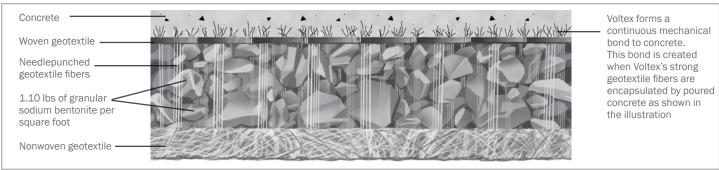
Cross section illustration of Voltex waterproofing membrane mechanically bonded to concrete
